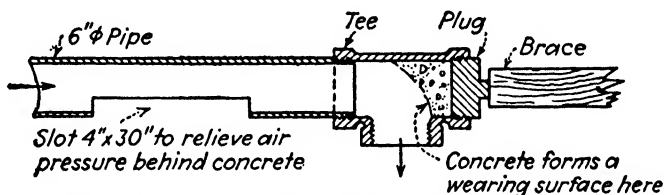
Side-discharge nozzle for pneumatic placer.
